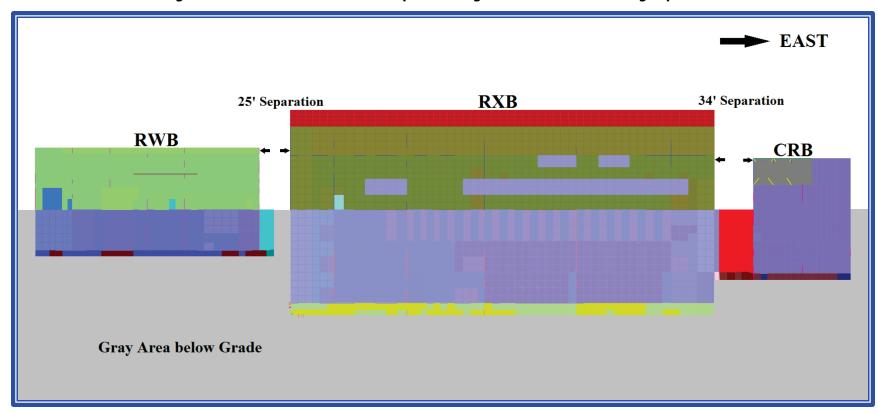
Isometric View of SASSI2010 Triple Building
